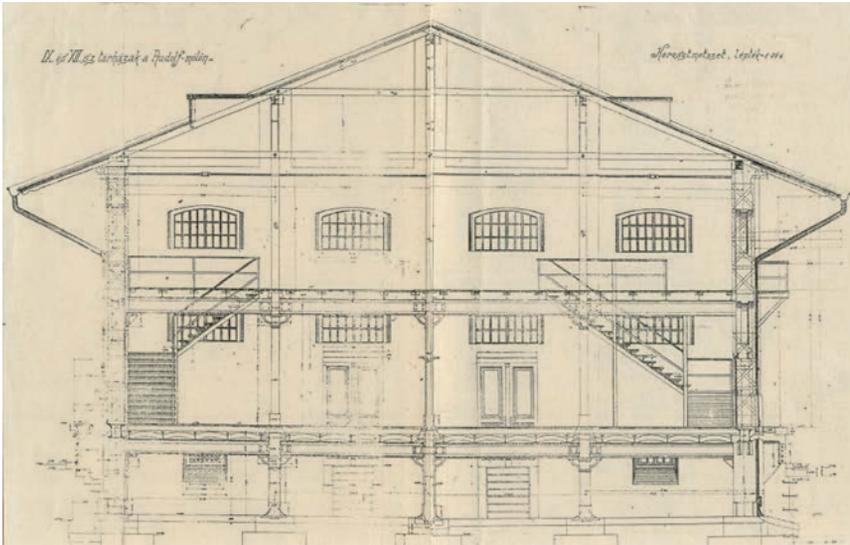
Port warehouses 8 and 11, 1888, transverse section [8]
